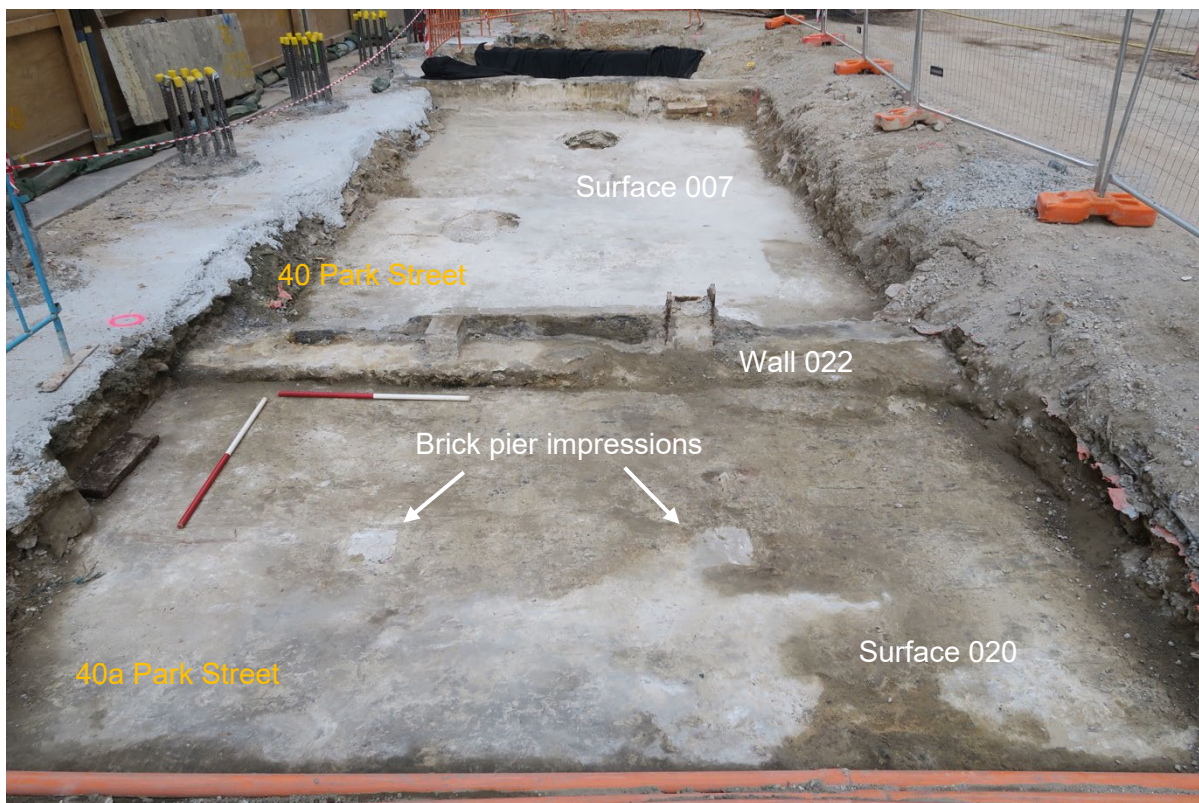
Concrete surfaces (020) and (007) when first exposed in the southeast section of Lot 17. View to west, scale 1m. IMG\_7031.
